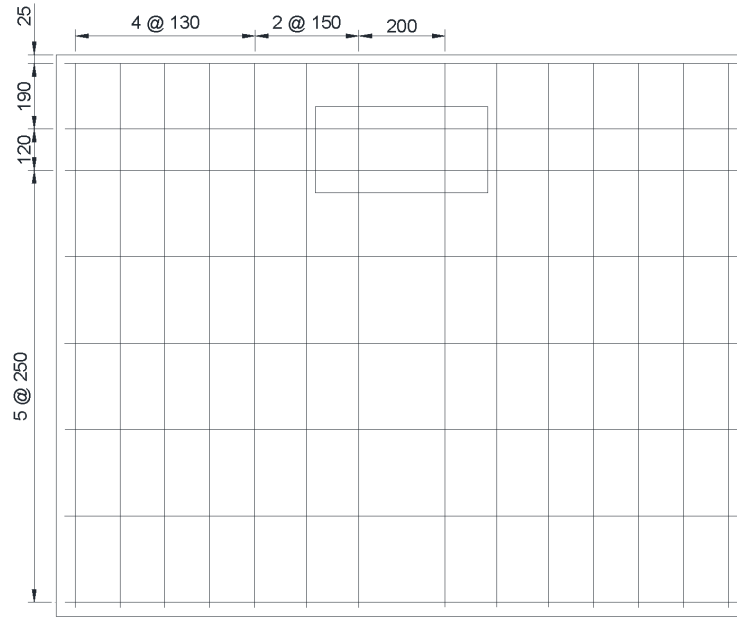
Bottom mat reinforcement details for Specimen 2 (10M bars) (units in mm)
